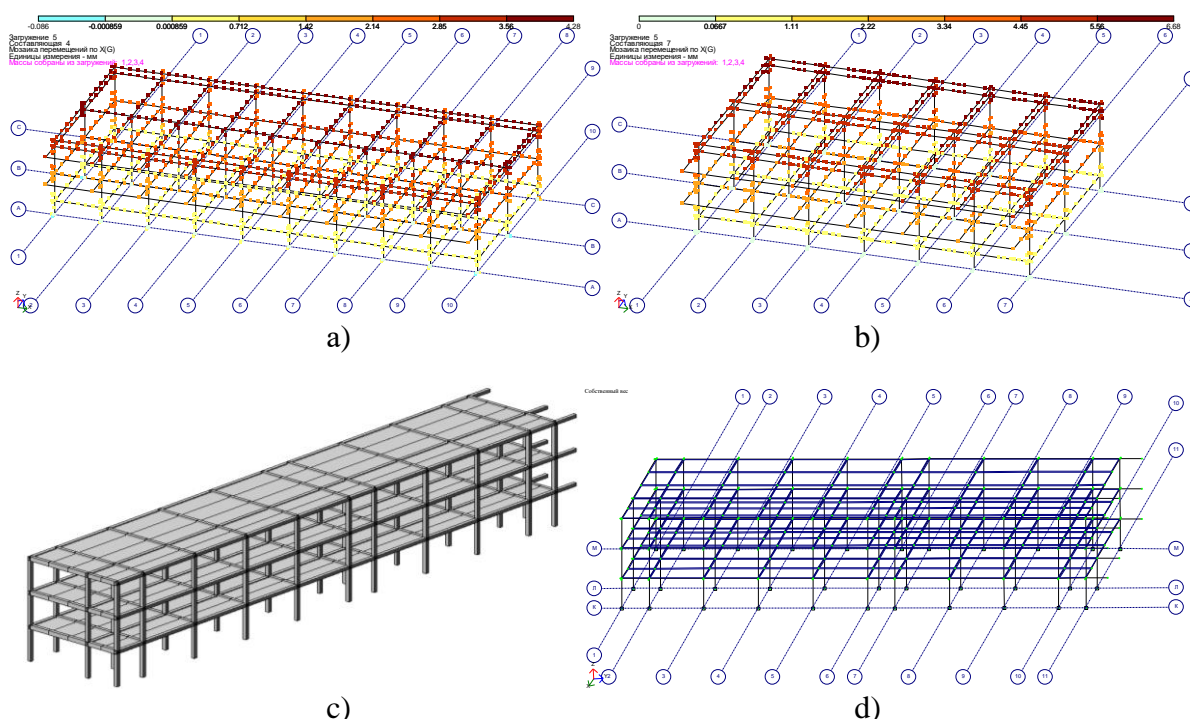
Design diagrams of building frames: a – PEI No. 27; b – PEI No. 14; c and d – general view and design diagram of the frame of the 2nd compartment of the building of school No. 248
